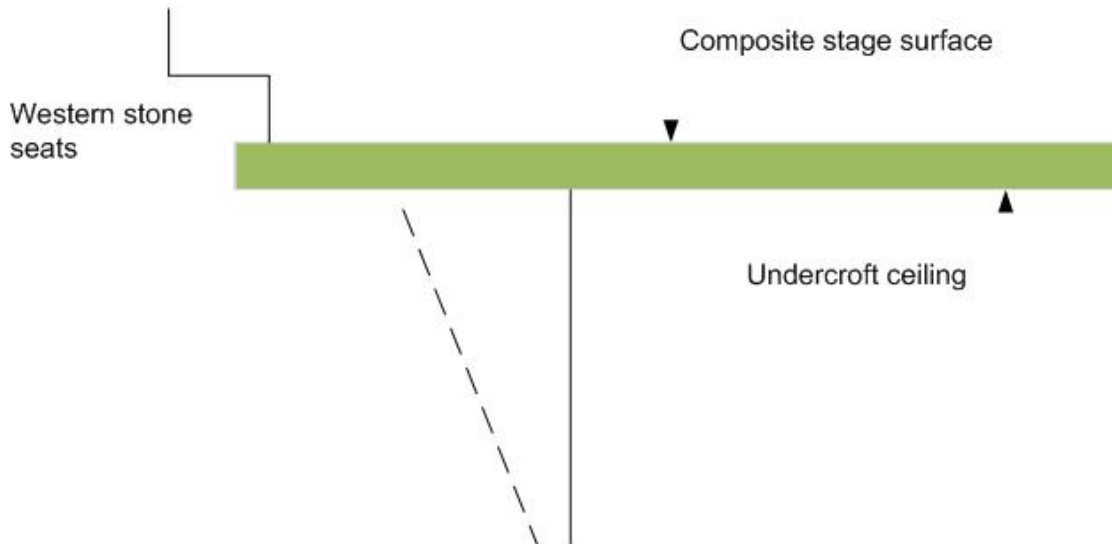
Sketch of DA Design showing juxtaposition between stage surface, service space, undercroft roof and undercroft ceiling, and disconnection between these and the western stone seats.
